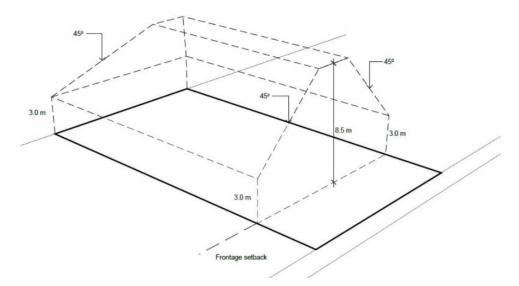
Building envelope as required by clause 8.4.2 A3(a) and clause 8.5.1 A2(a)
